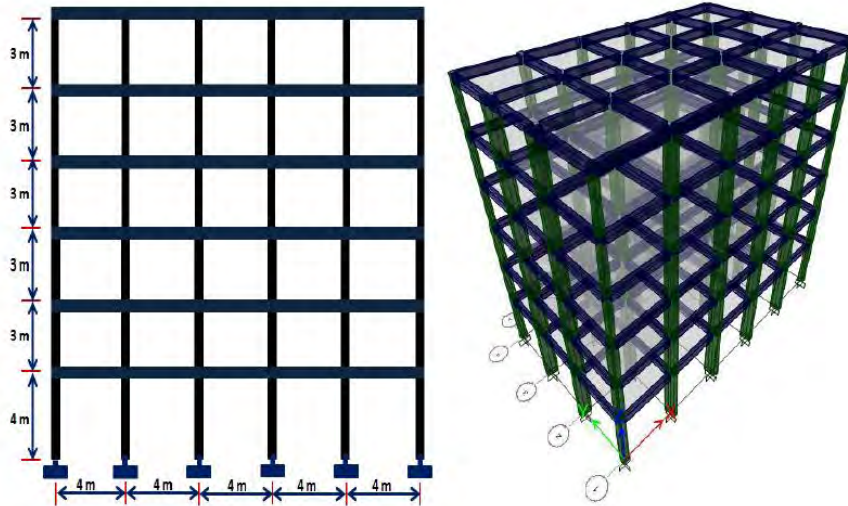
Schematic representation of typical front view and 3D view of the bare frame building model for the 6-storey residential building
